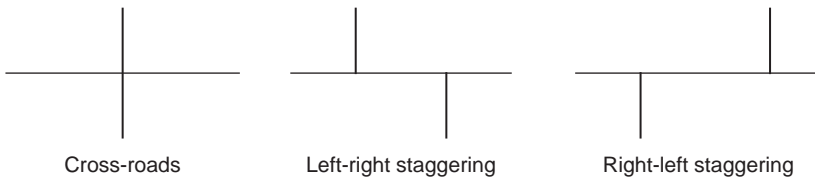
Different ways of dividing one crossroad into one staggered junction.
